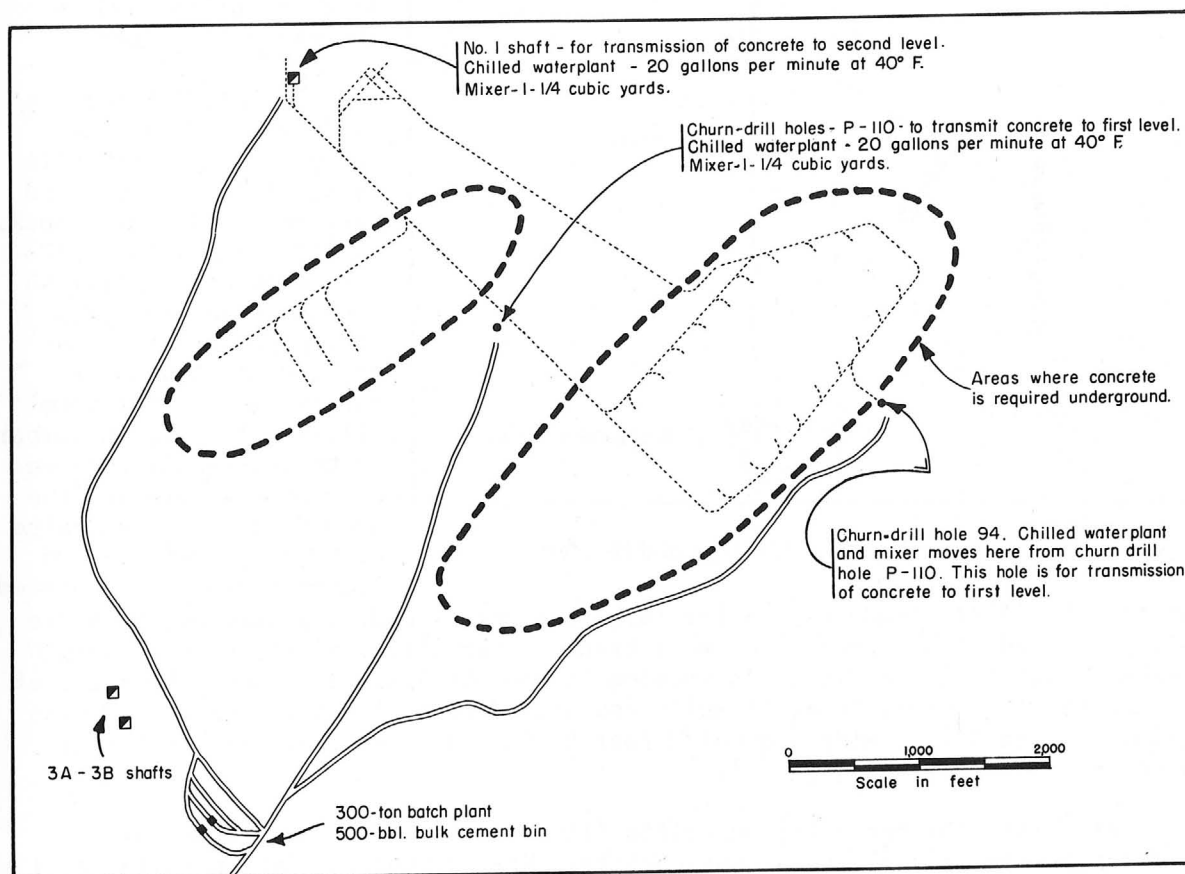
Location of Concrete Batch Plant, Mixing Stations, and Areas Where Concrete is Used Underground.
